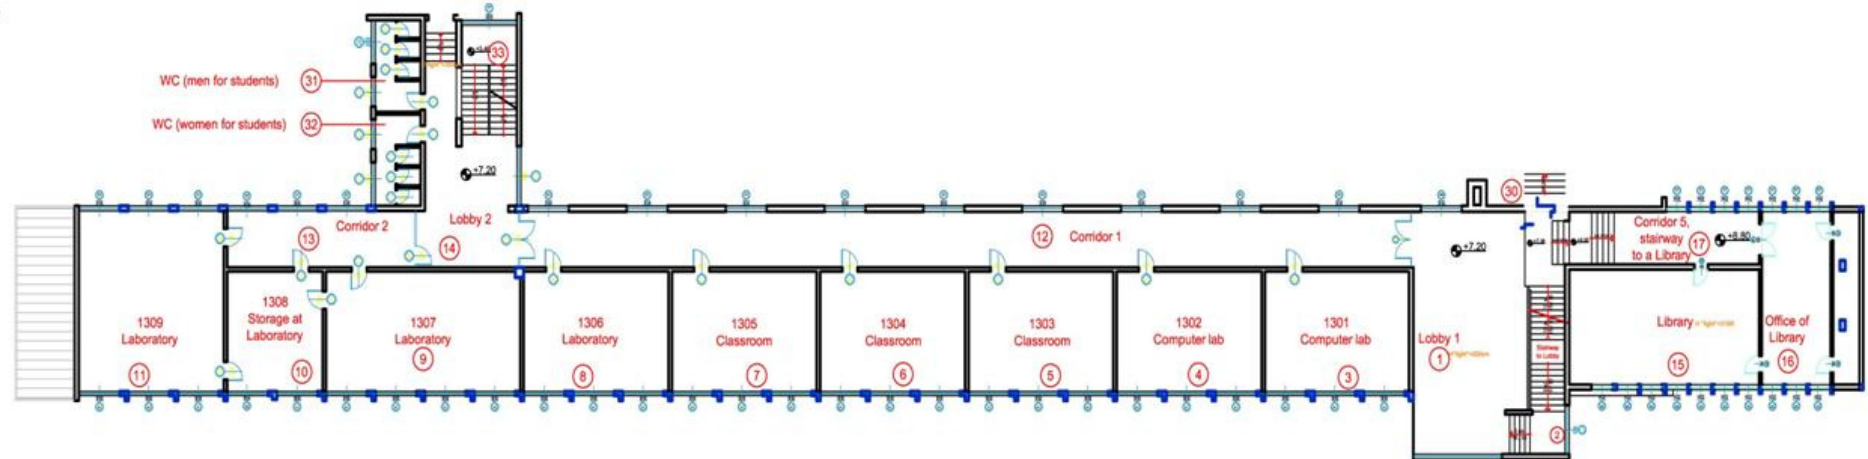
Plovdiv School: 3rd floor Rooms and existing provisions
